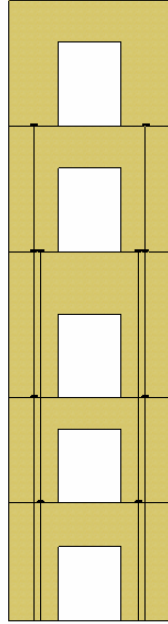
Anchorage of tensile bars over the height of the wall (wall 1/3)
